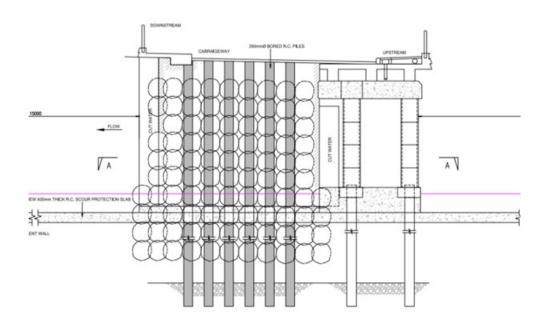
Mini-piles from bridge-deck Level (Not to scale. Extracted from Drawing No. 1009).
